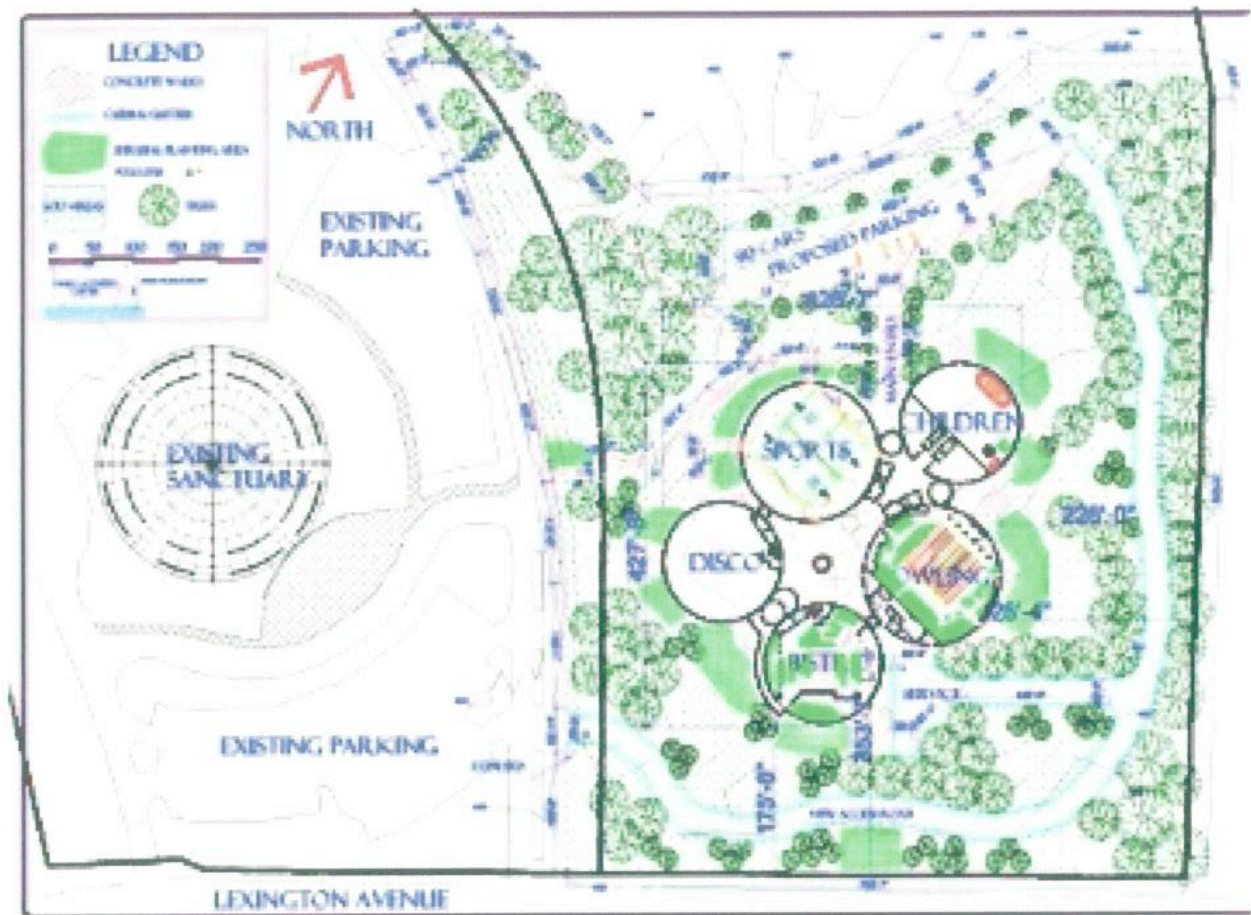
Layout of the Planned Expansion for Faith Chapel Showing Existing Structure on the Left (25).
